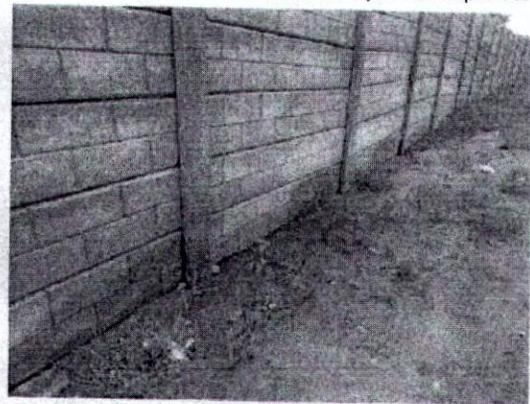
Photo of gaps below the boundary wall around the dump site through which fluids can leak
